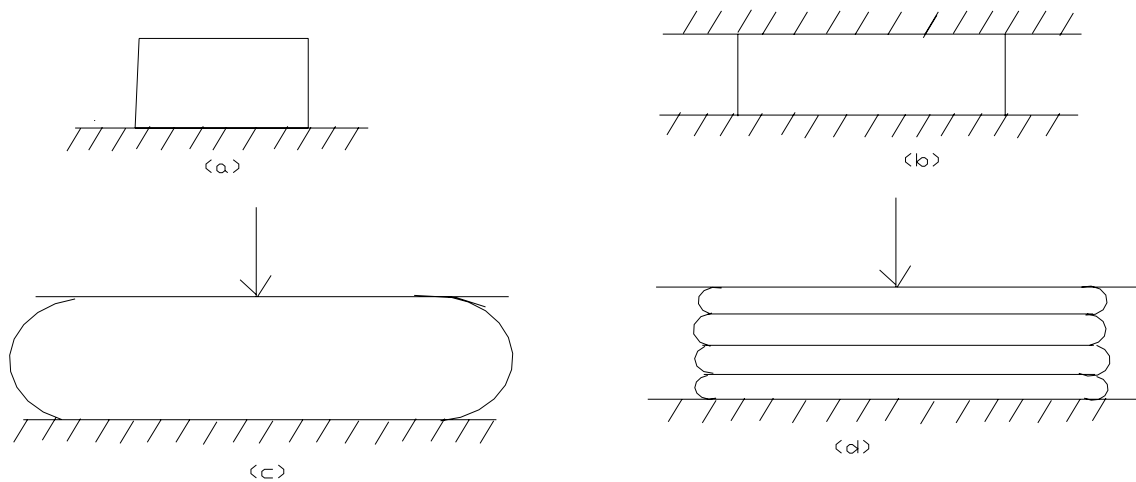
Compressive behavior of Elastomeric bearing Pad.
